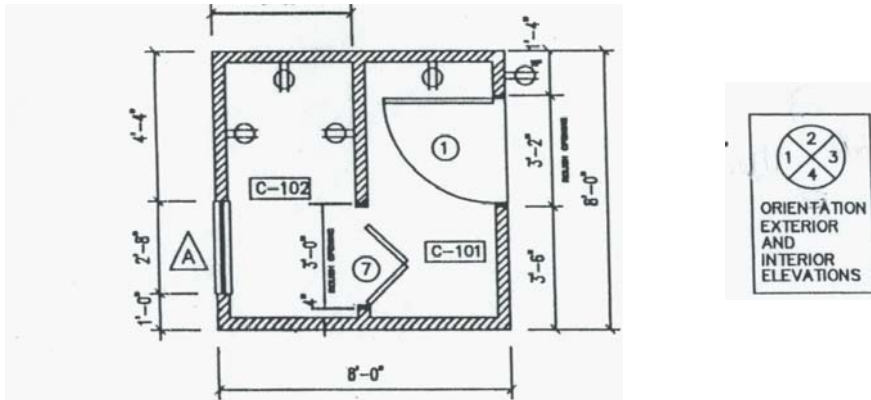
Floor plan for Modules S-1 and C-1. Walls were numbered according to the orientation key. Wall 1 is the North wall. Compass orientations are nominal.
